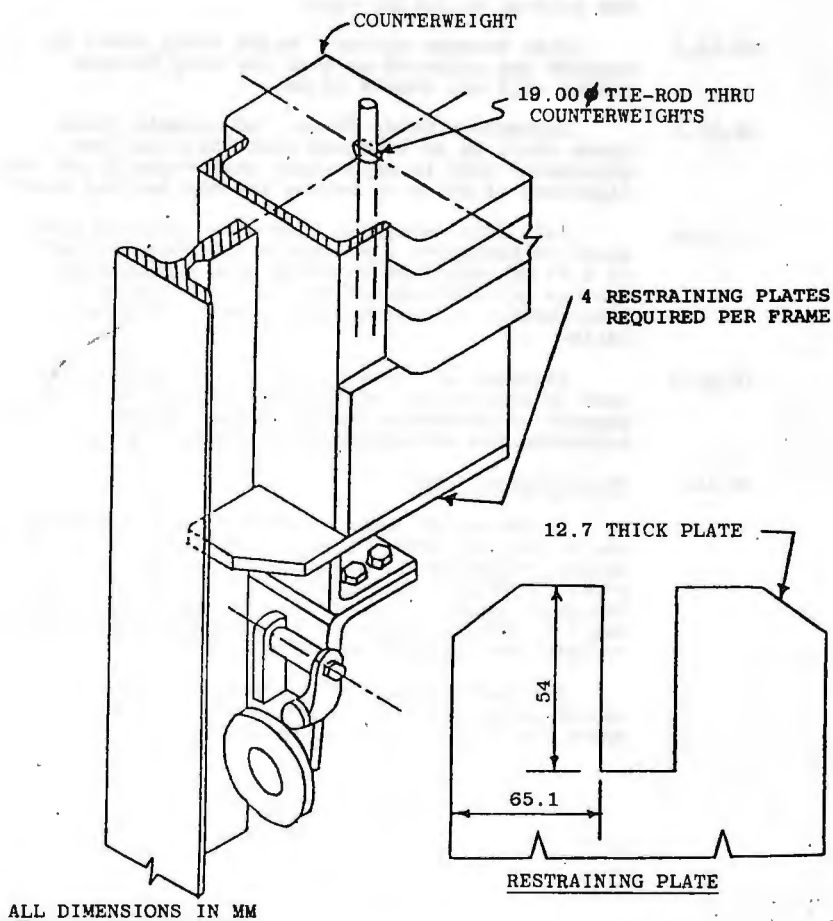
LIFT COUNTERWEIGHT AND CAR FRAME
